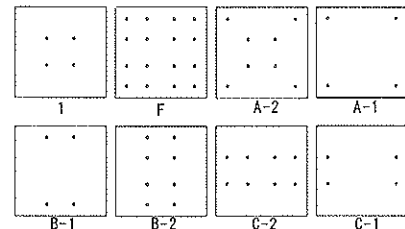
Specimen for the test of bolted cross-lapped joints (Unit: mm)
